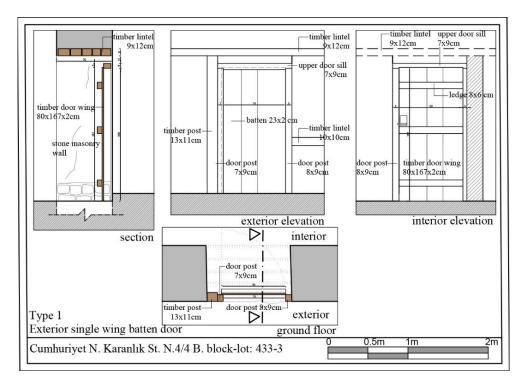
Drawing of exterior single wing batten door located on the masonry wall; Type 1 (Cumhuriyet N. b.block-lot:433-3)
